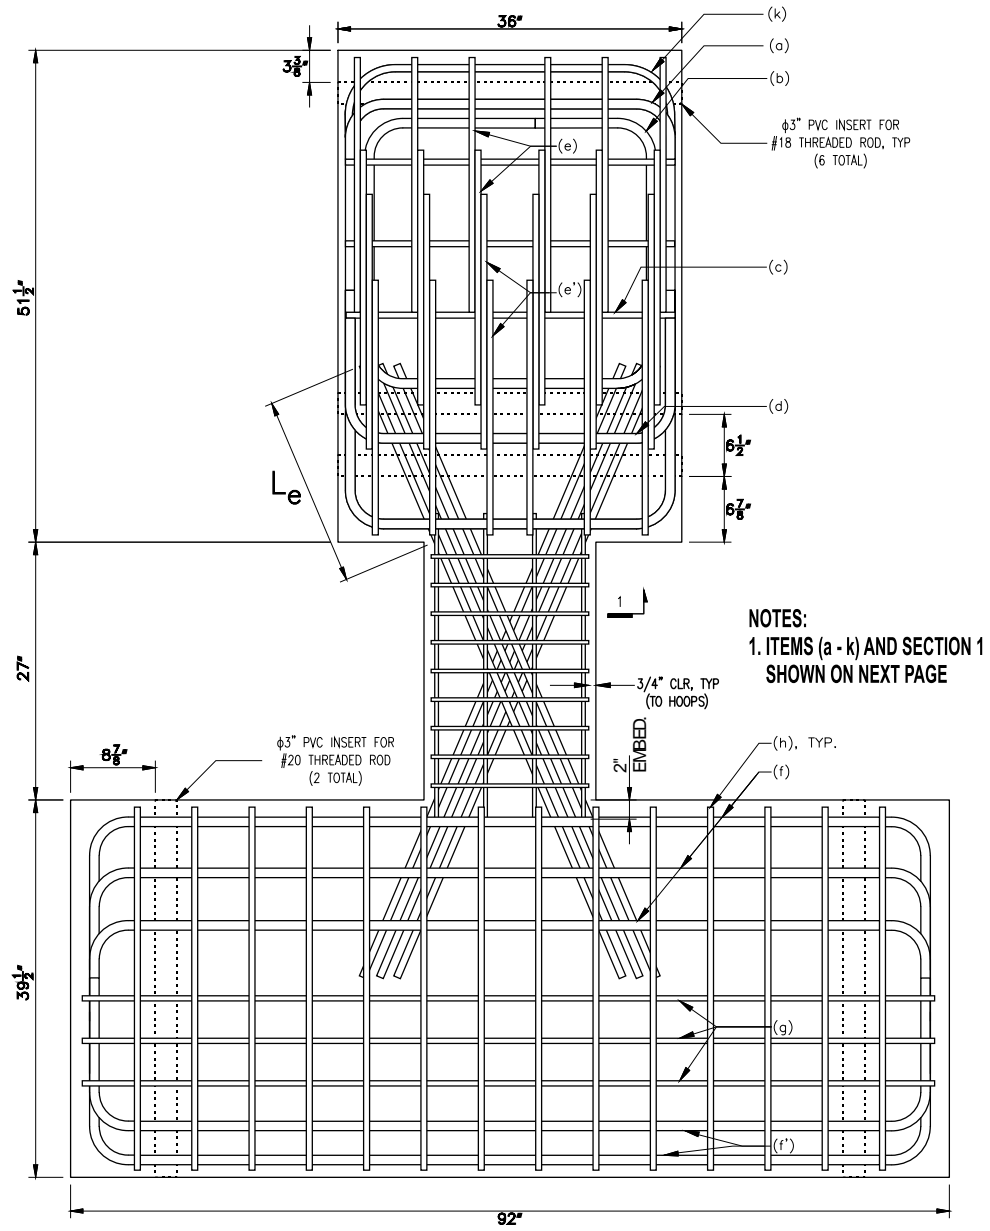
Elevation view of D80-1.5 (1 in. = 25.4 mm)
